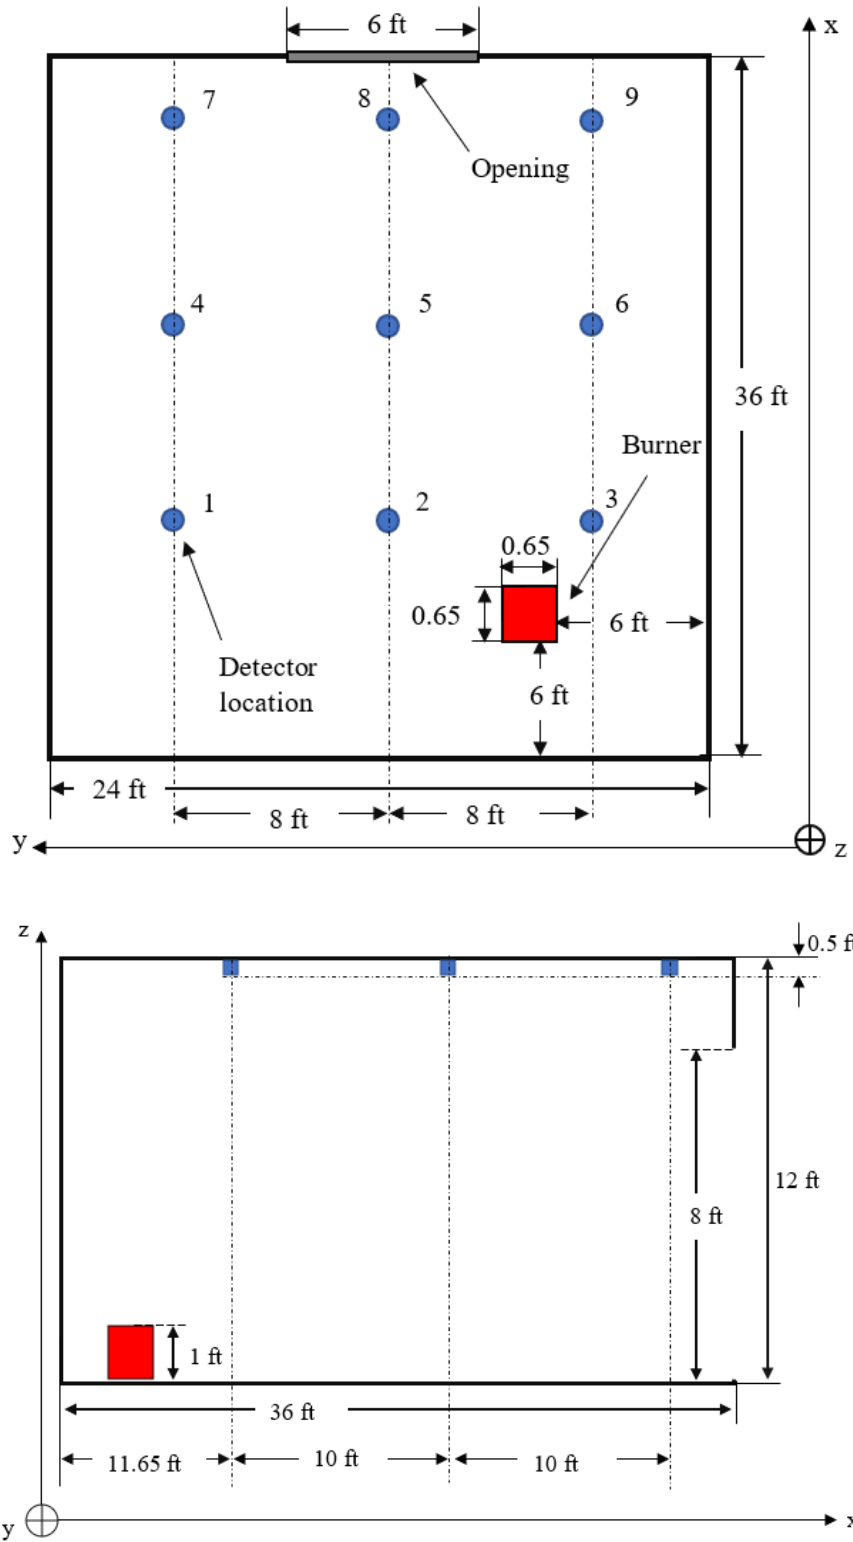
Plan (top) and elevation (bottom) views of the default compartment.
